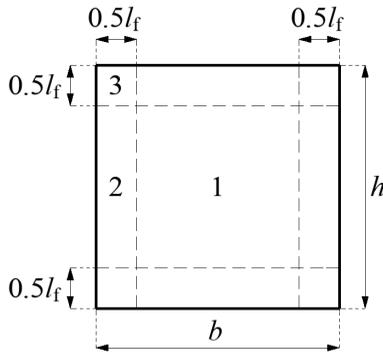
Cross section zones (Dupont and Vandewalle, 2005)
